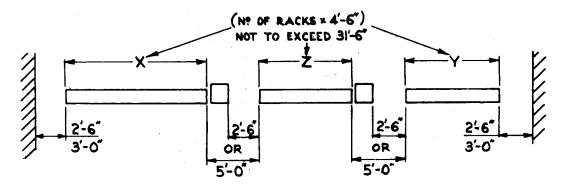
GENERAL CONDITIONS FOR SITING COLUMNS ACROSS A BUILDING, A MAXIMUM OF 7 AND MINIMUM OF 4 RACKS IN EACH GROUP SHOULD APPLY.
